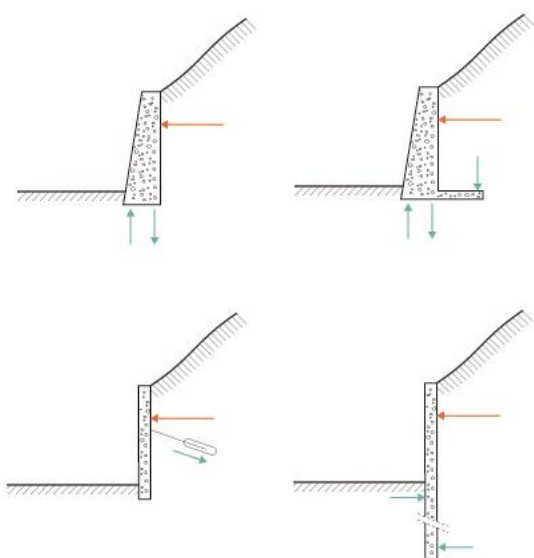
Methods of stabilizing the sloping ground. a) Retaining wall. b) Gravity wall. c) Anchored wall. d) Piling wall (Shock Safe Nepal group 1).
